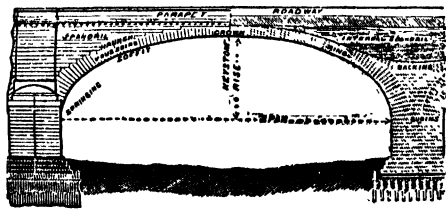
Half Elevation and Half Section of Arch of London Bridge.
